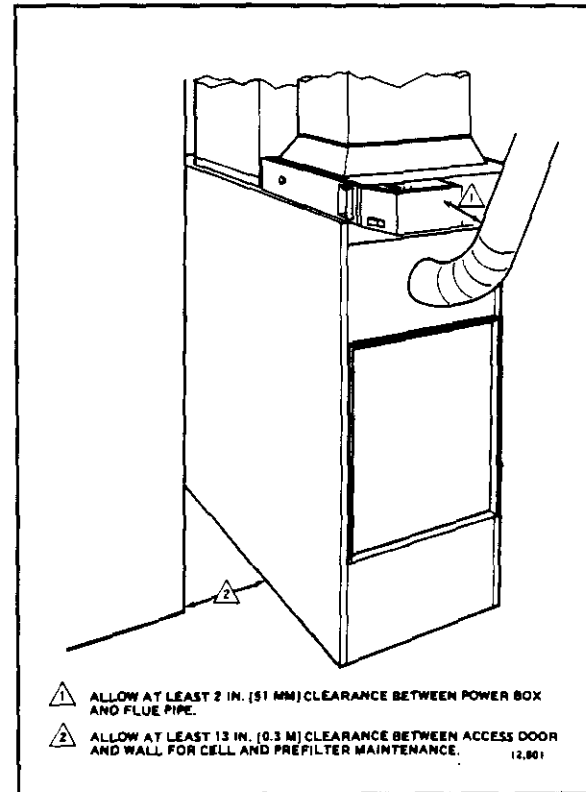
LOWBOY FURNACE. AIR CLEANER IS MOUNTED HORIZONTALLY IN RETURN PLENUM JUST ABOVE FURNACE, OPPOSITE HEATING PLENUM.
